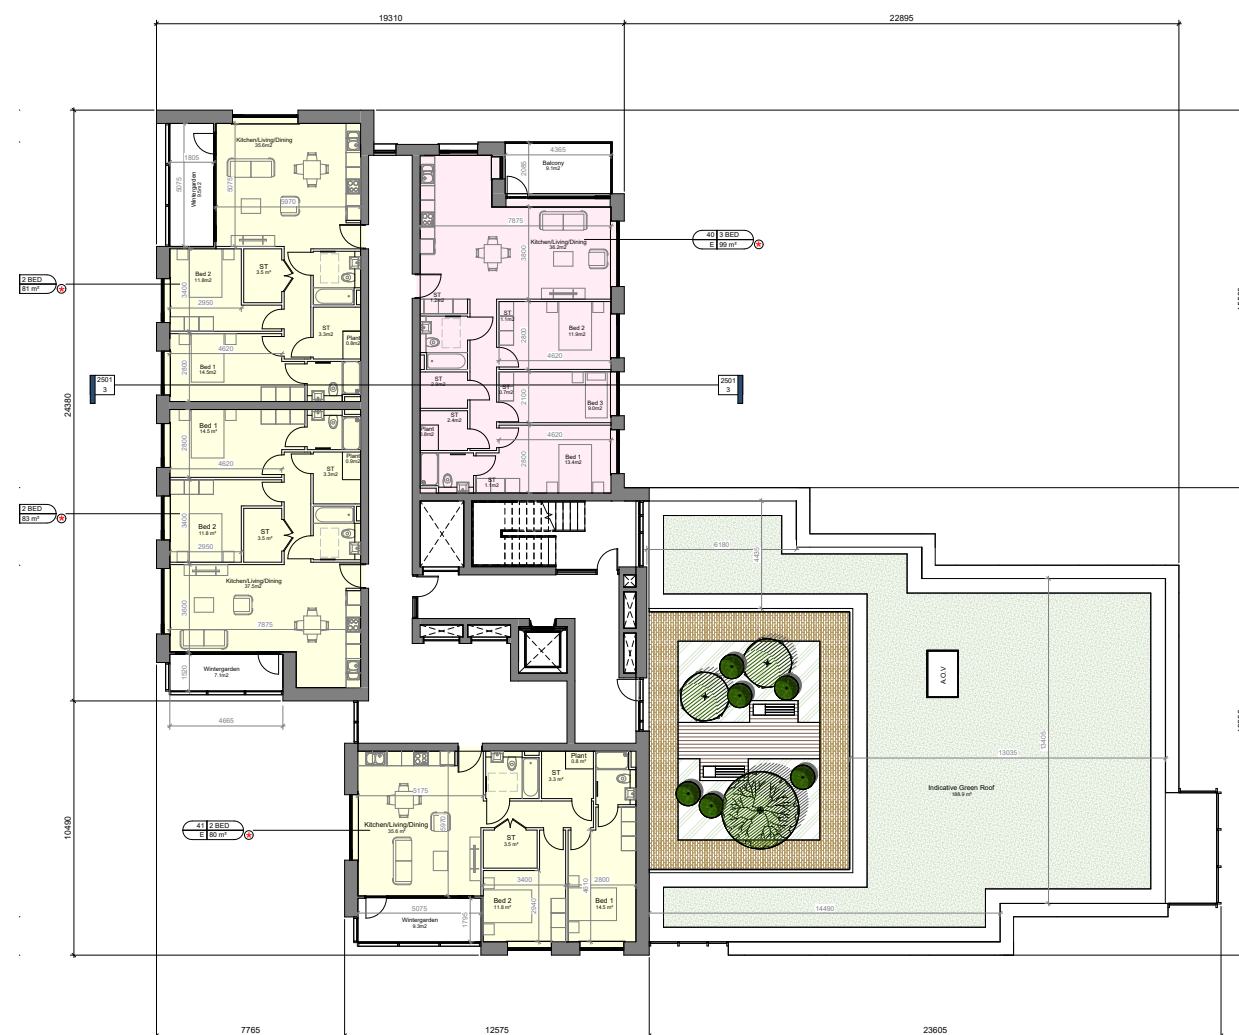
Block E- Sixth Floor Plan Source: MCORM, 2026.
